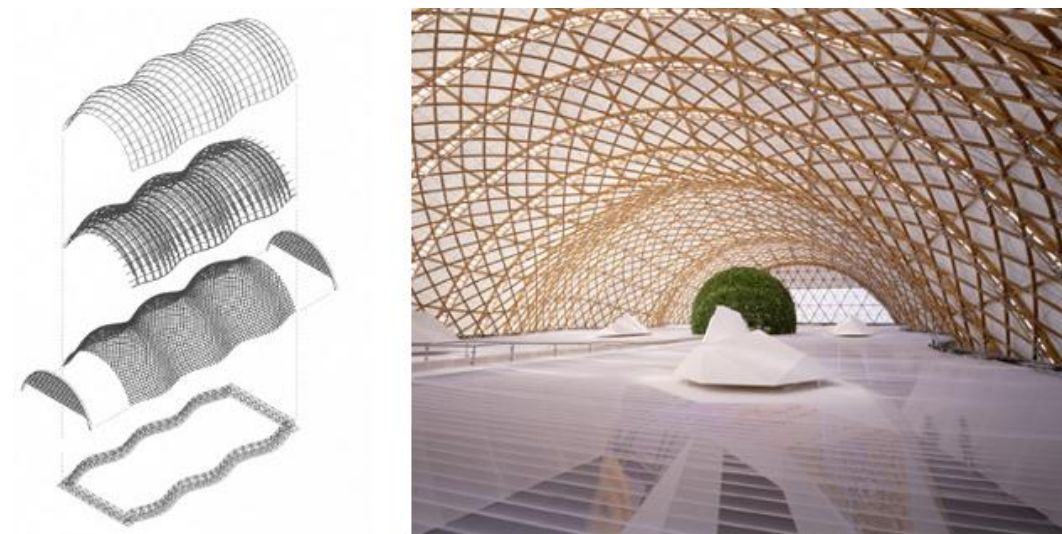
Japan Pavilion gridshell at the EXPO 2000, Hannover (Germany), made of paper tubes and bracing timber frame [34]
